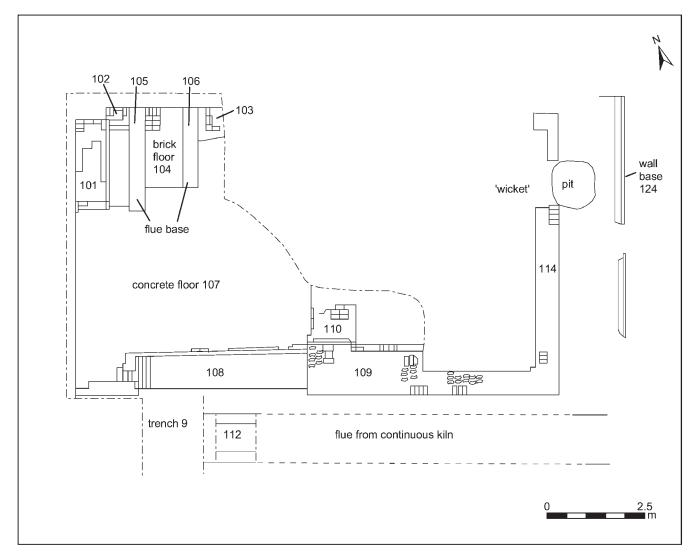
Seymour Street, Chelmsford. Plan of the Scotch kiln.
